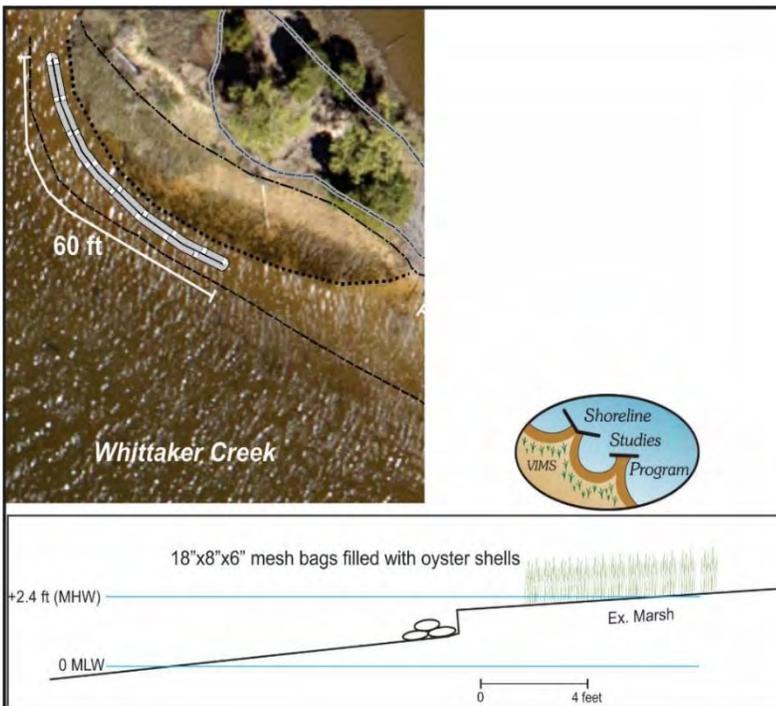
Planform and cross-section from the permit application for Site 6.
